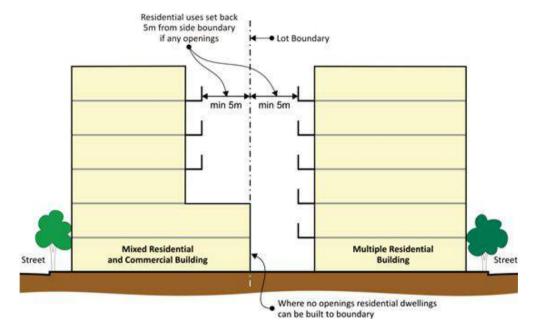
Multiple Residential Setbacks
